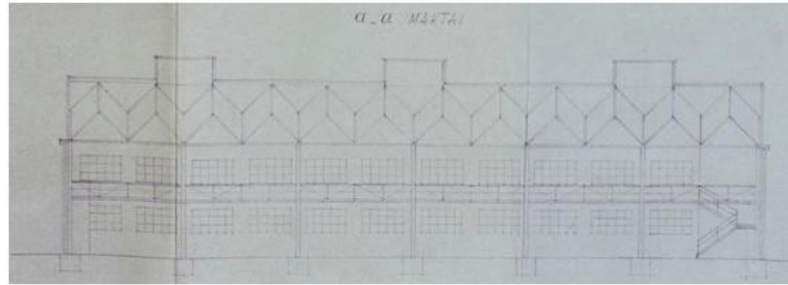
Aircraft Hangar ordered to Germany, plan drawing
